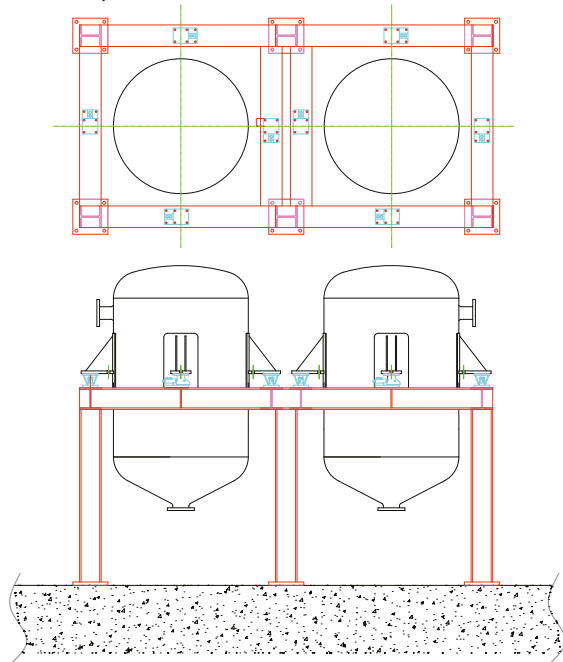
shows tank scales mounted on a steel structure with six vertical columns. Each tank is surrounded by a square frame with the weigh modules supported at the center of the beams. These beams will bend and result in more deflection compared to Figure 5-21c above. The tanks share the two central columns but the tanks remain reasonably well isolated to minimize crosstalk.
